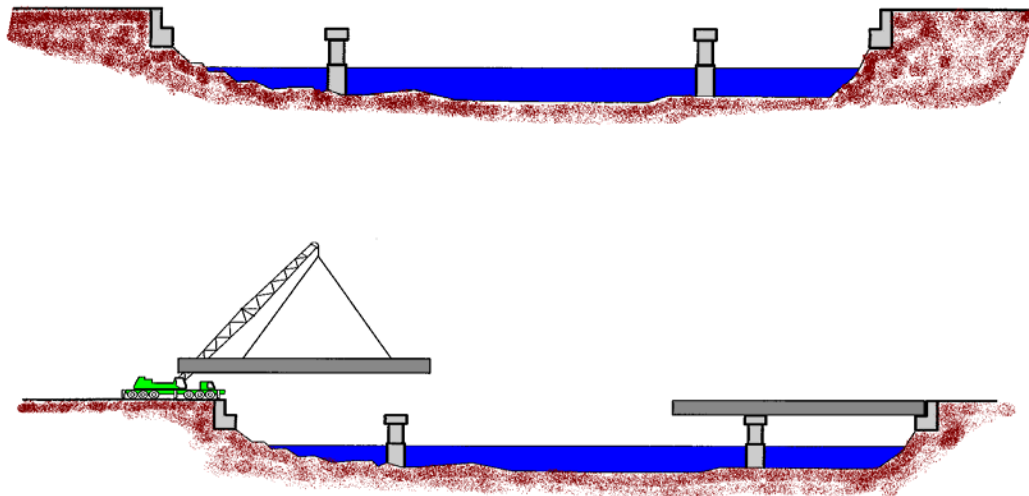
Typical Multi-Span Spliced Girder Construction Sequence
